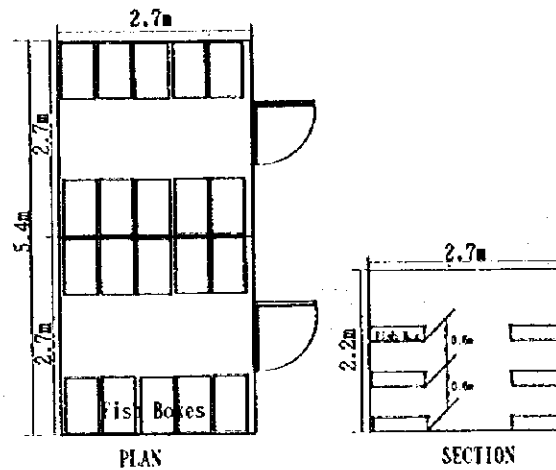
Dimension of Cold Storage and Shelves Arrangement
